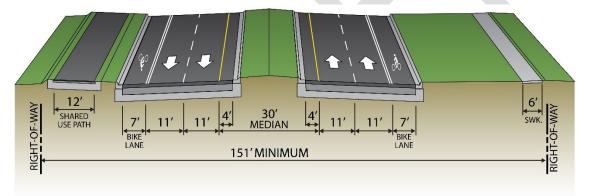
Preferred Alternative Typical Section from Fowler Avenue to Stacy Road
